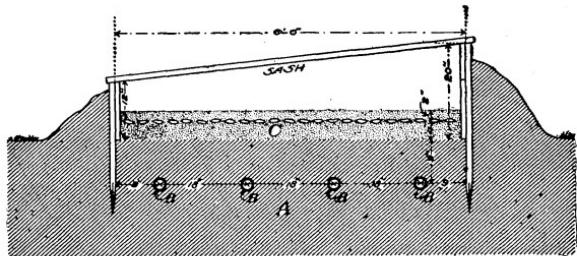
Cross section of pipe-heated plant bed. A, natural soil; B, hot water or steam pipes; C, sifted sandy loam or leaf mold.
